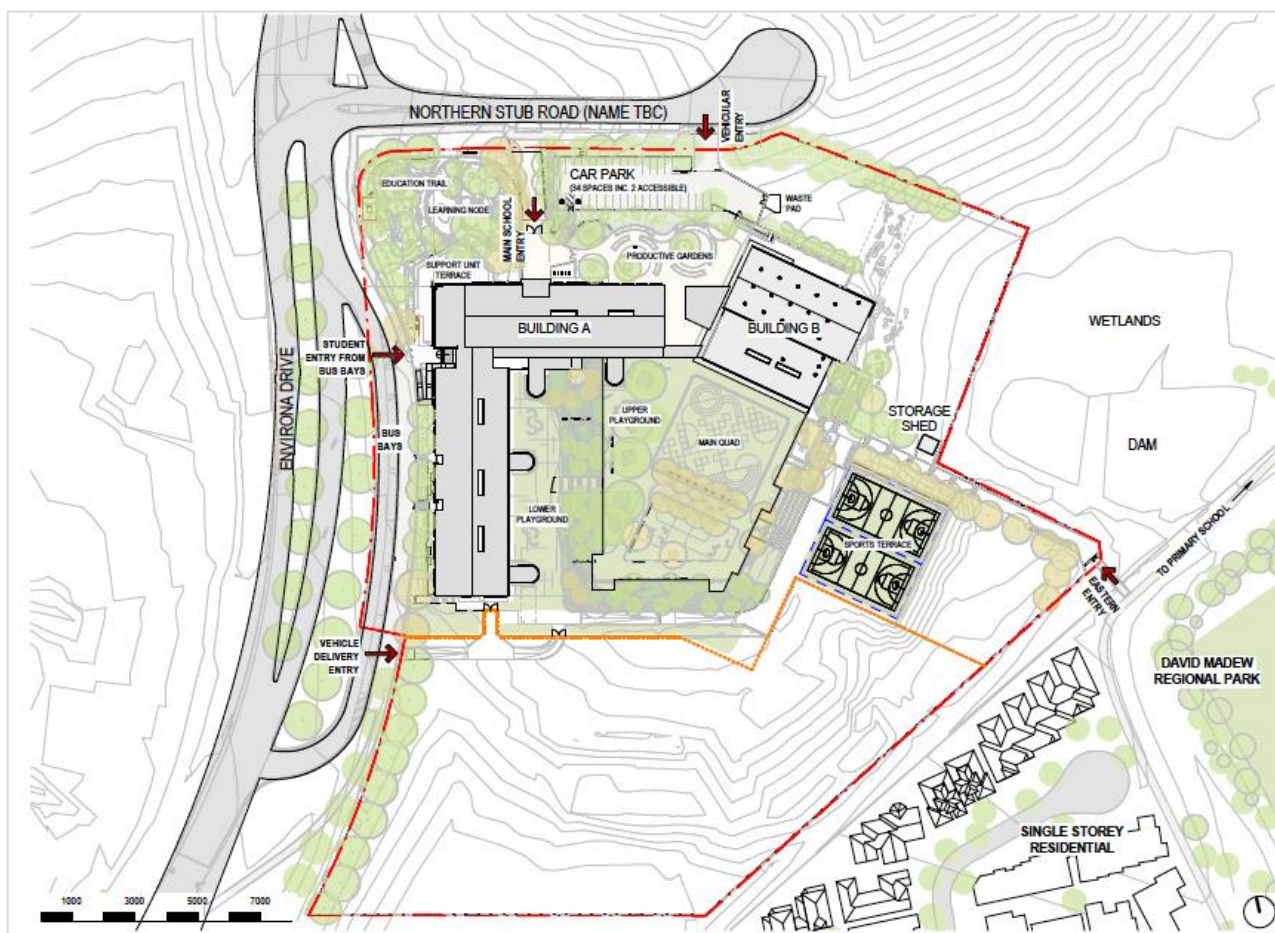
Proposed landscape site plan, Source: CONTEXT Landscape Architecture
